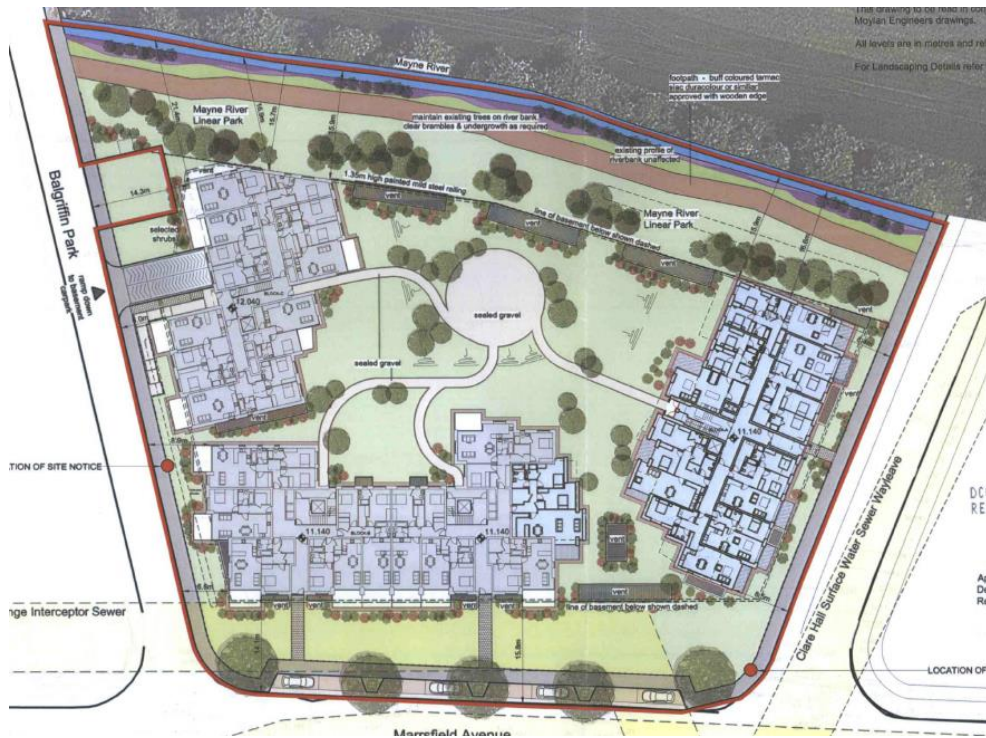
Permitted neighbouring development with riverside walk which this development will connect into
